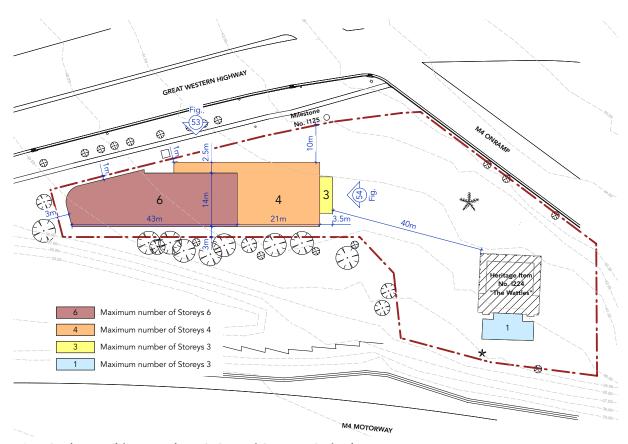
Plan - Building Envelope & Ground & Upper Setbacks
